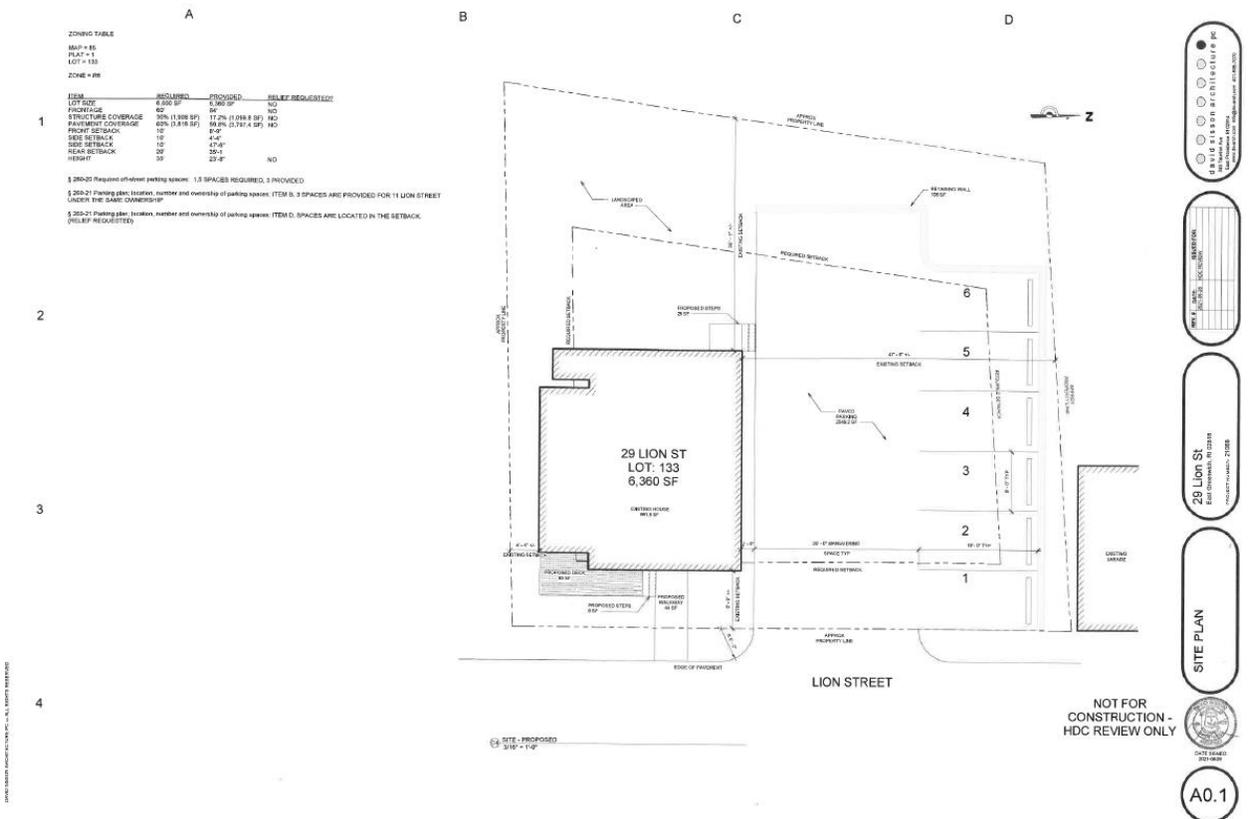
Preliminary survey of 29 Lion Street showing 6 parking spaces
